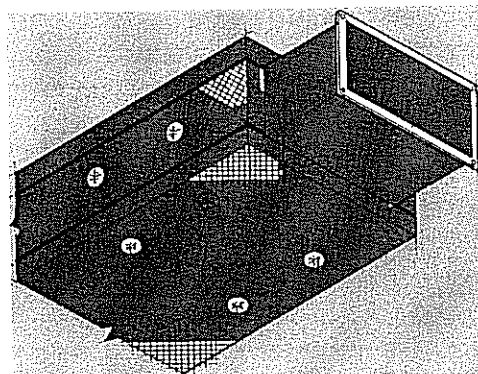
Conlit Ductwork Fire Protection System by Rockwool
